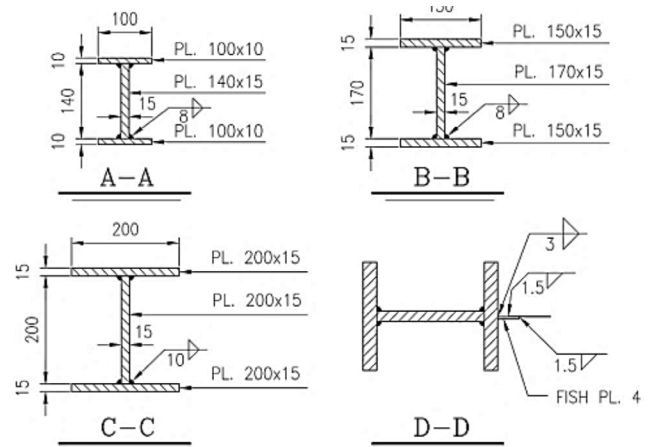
HBE and VBE sections (mm): (a) Section top HBES, (b) Section VBEs, (c) Bottom HBE, and (d) Details of fish plate connection to the boundary elements. (Note: HBE: Horizontal boundary element; VBE: Vertical boundary element)
